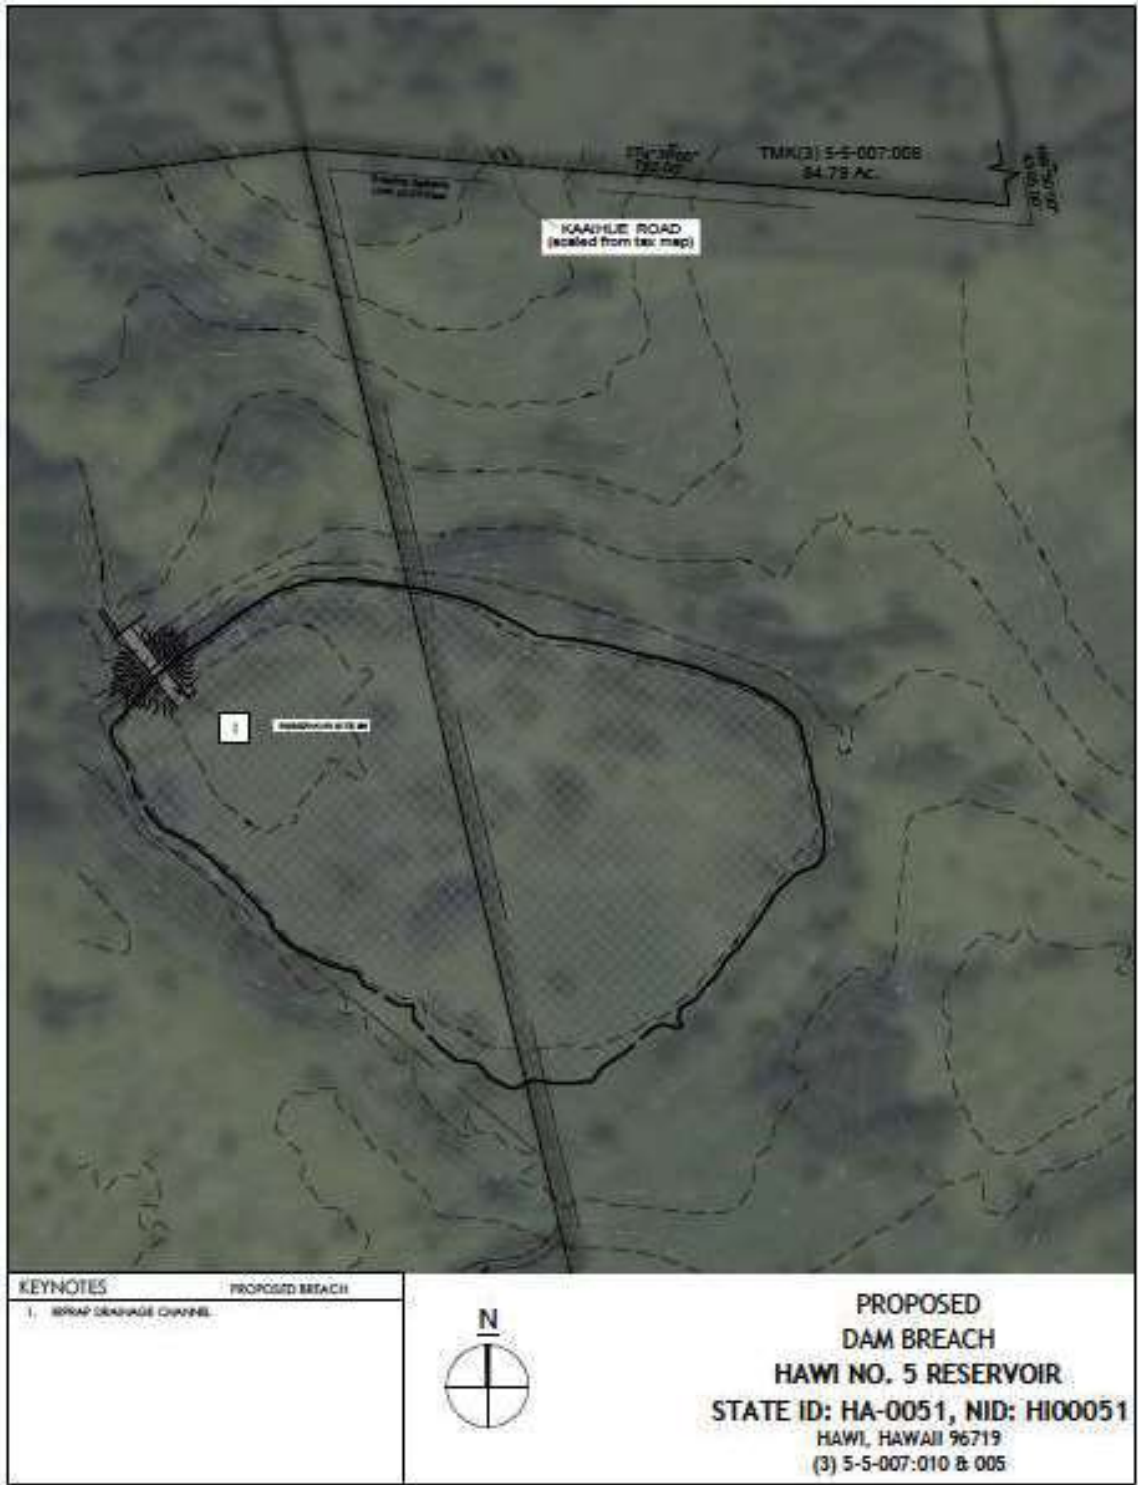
Proposed project plan of breaching the northwest embankment (Design Report, Green Aina Planning & Engineering, January 2023).
